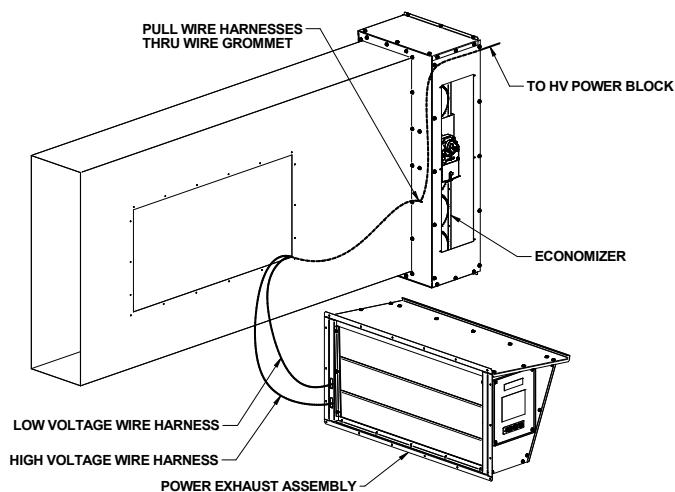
7½-12½ Ton Power Exhaust Wiring
